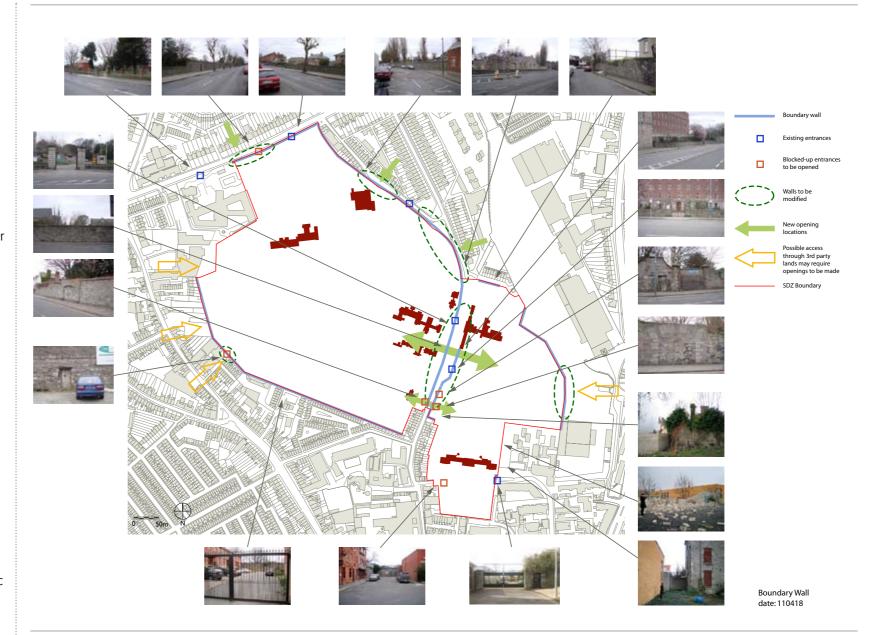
11: Map of Grangegorman site indicating extent of existing boundary walls
